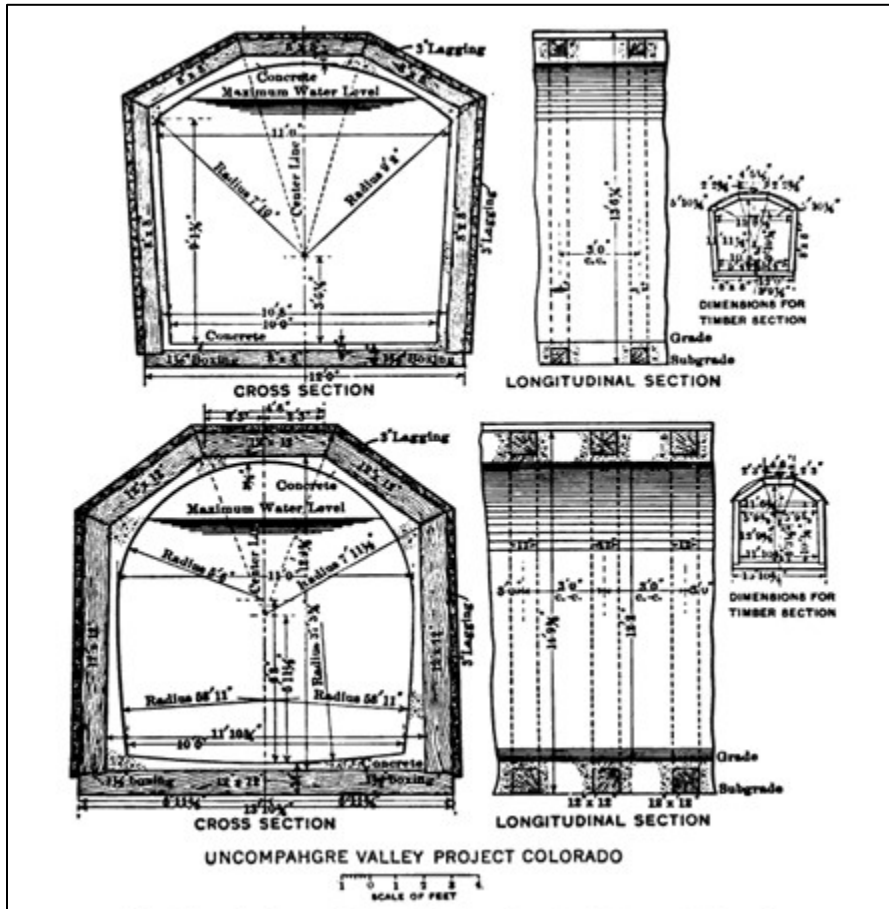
This schematic drawing shows the wooden framework and concrete lining for the Gunnison Tunnel in the Uncompahgre Project (Colorado).²²⁹
